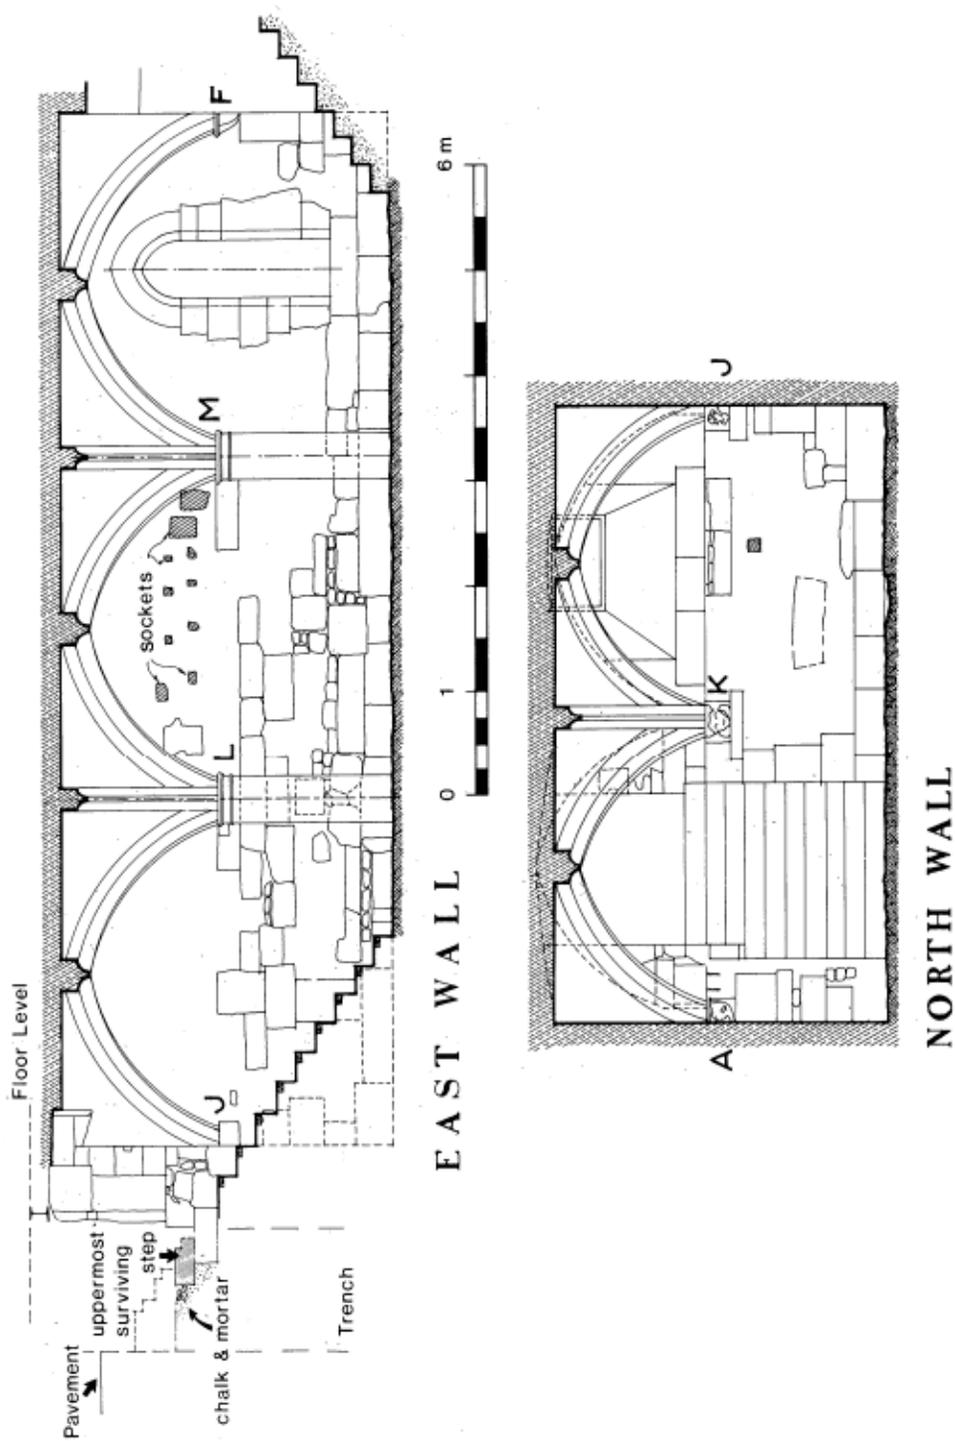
72/74 High Street, Guildford, East and North Walls of Undercroft
